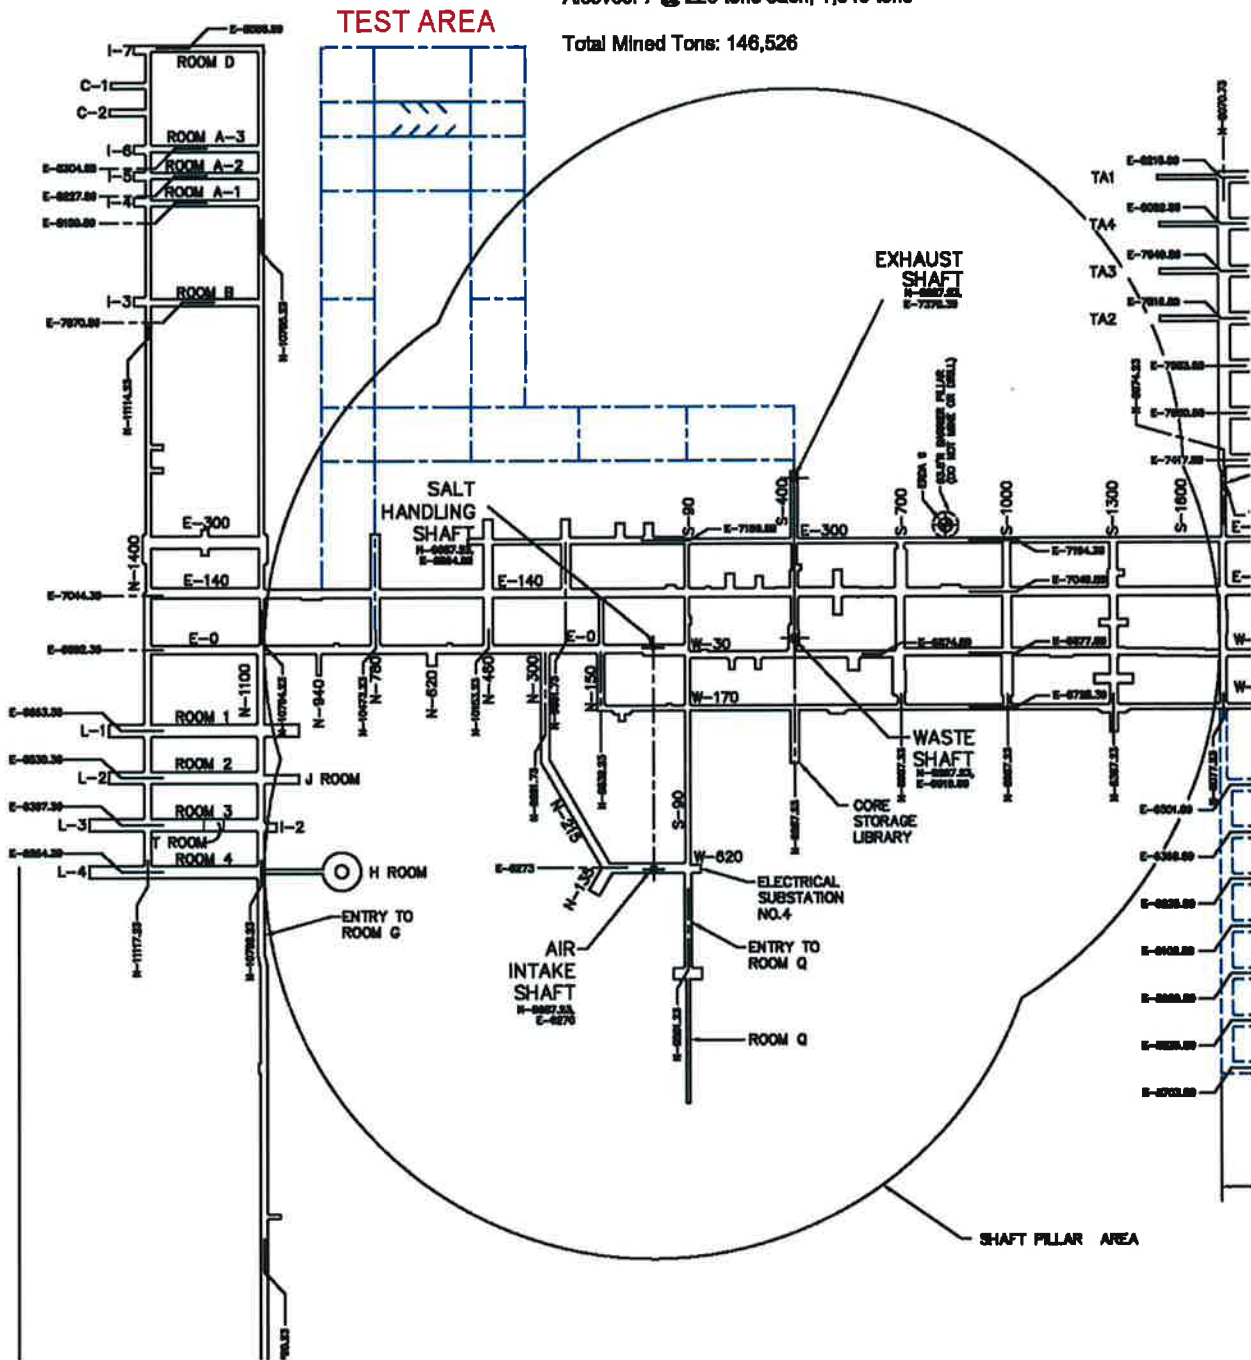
Plan View of the Mining Layout for the SDI In Situ Test
